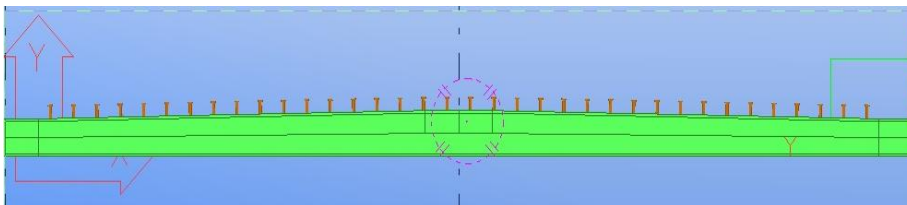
Base of the Bridge Structure (Structures, Tekla.)
